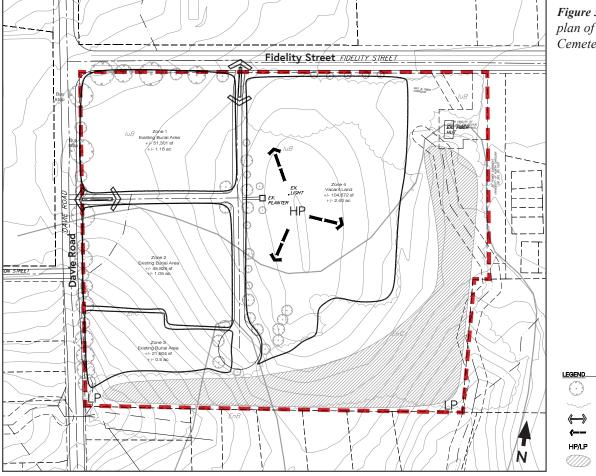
Topographic plan of Westwood Cemetery. (CVDA)
